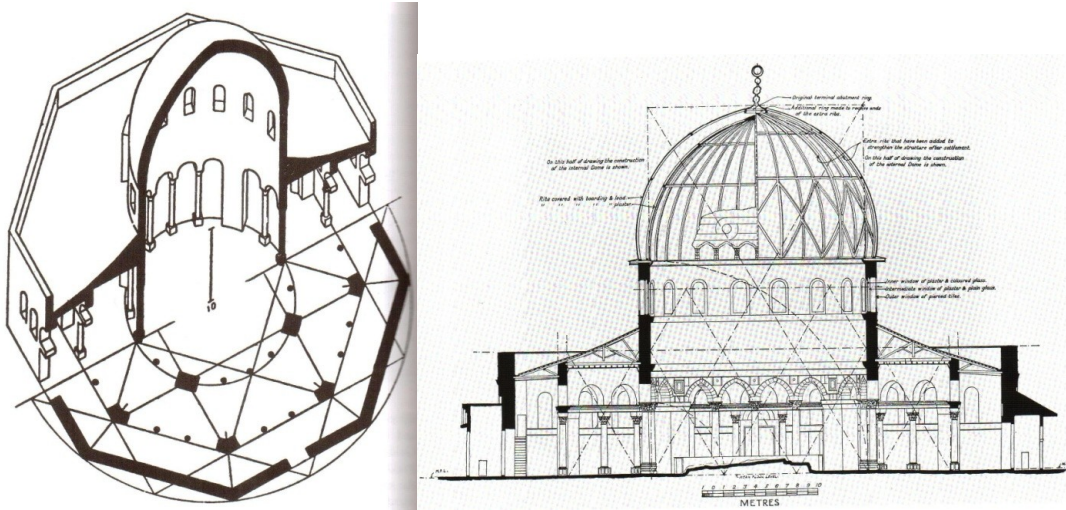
Elevated plan of the Dome of the Rock (Grabar 2005,6; Ettinghausen, et al. 2001, 16)
